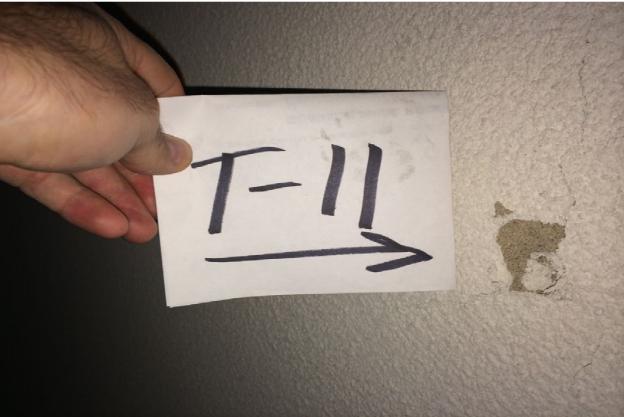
Laboratory analyses detected 20% chrysotile asbestos within spray on surfacing material sample TS-11 collected from the Theatre Building upstairs projection room ceiling.
